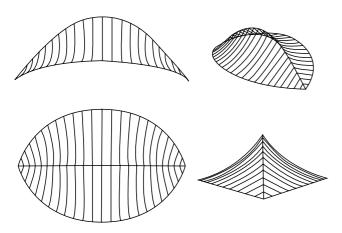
Front and side elevation, perspective view and plan of membrane supported with one arch.
